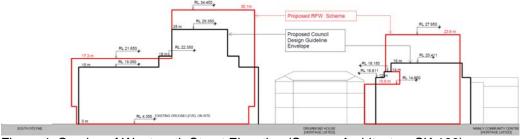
Overlay of Wentworth Street Elevation (Source: Architectus, SK-100)
